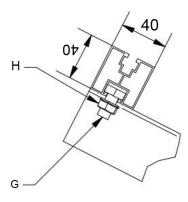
Installation of the transverse rail (F, F1) (connection of rails with an inclined beam)
